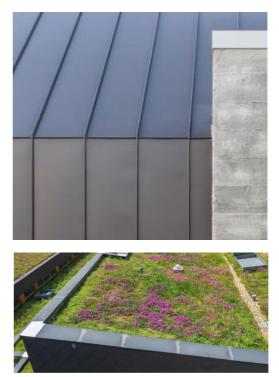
Standing seam zinc and green roof. Proposed materials for the roof extension.
